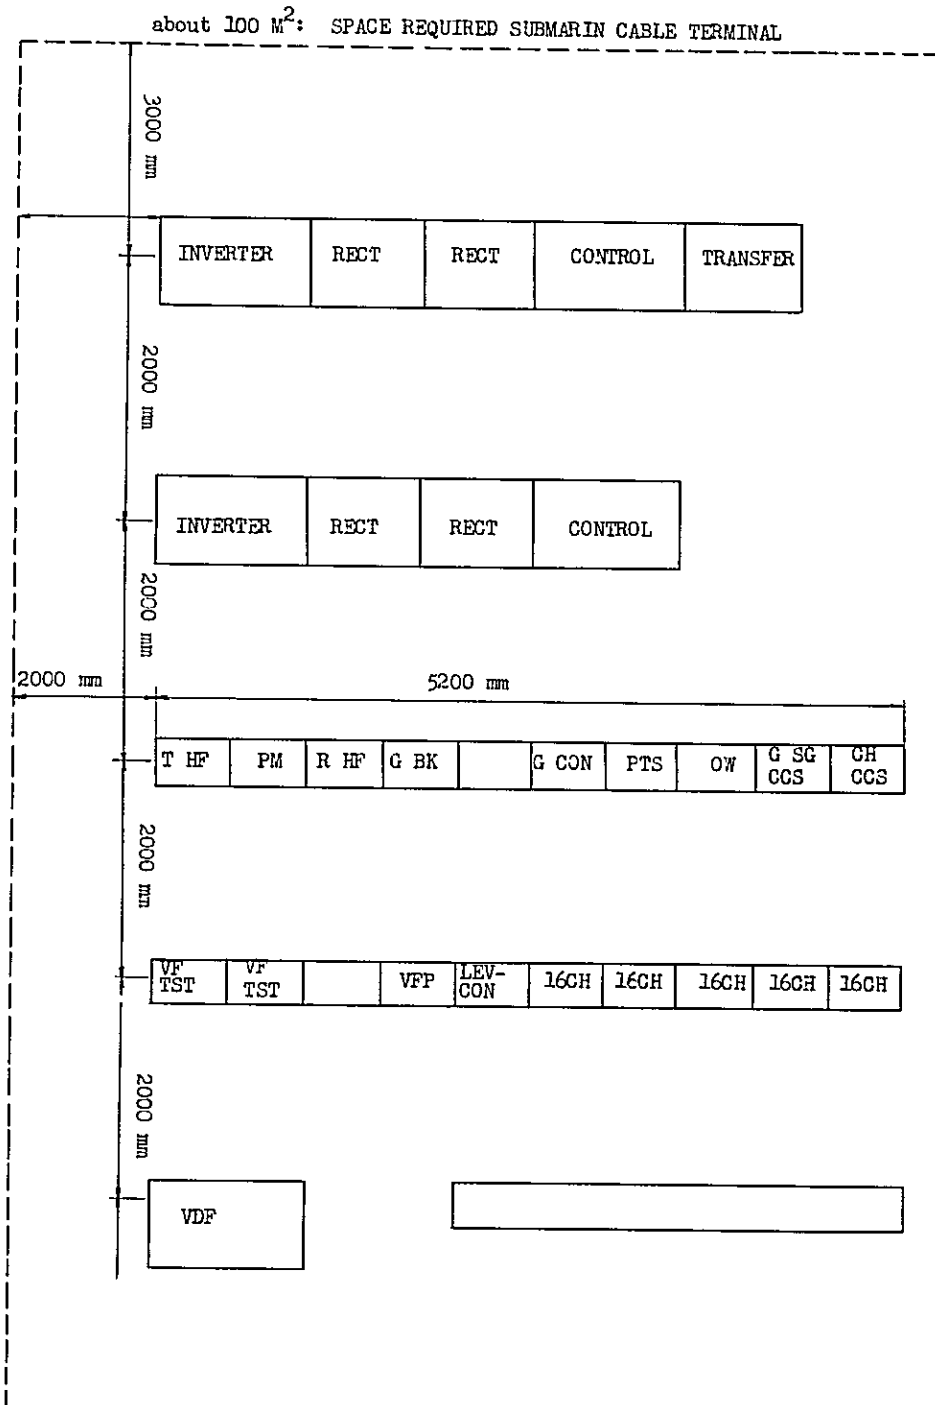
TYPICAL FLOOR PLAN OF CABLE SYSTEM
